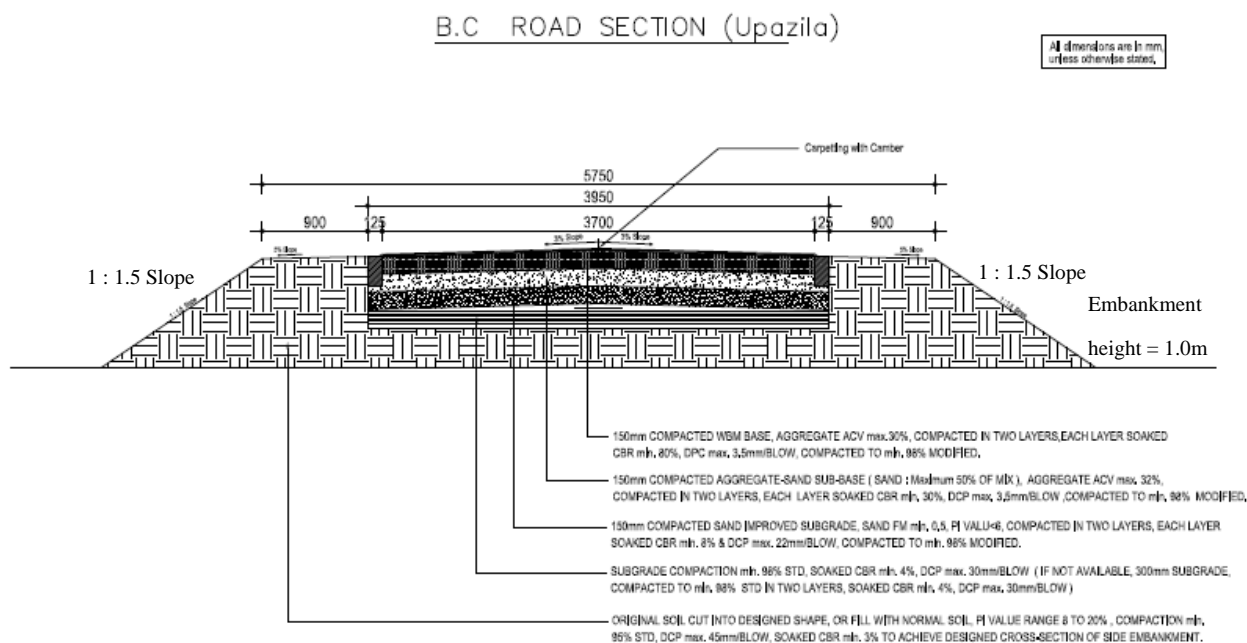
B.C Road Section (Non-submerged) (Upazila Road)
